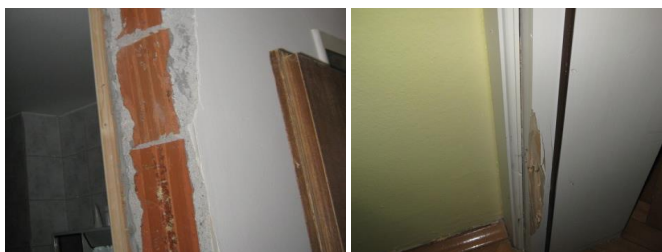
Bathroom damaged door opening and bedroom door frame
